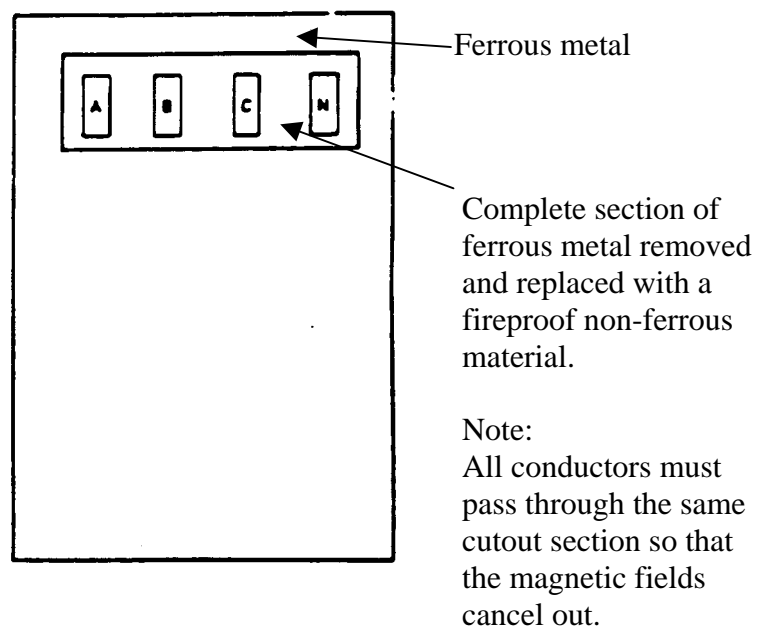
Typical Arrangement that Would Not Require Slotting
